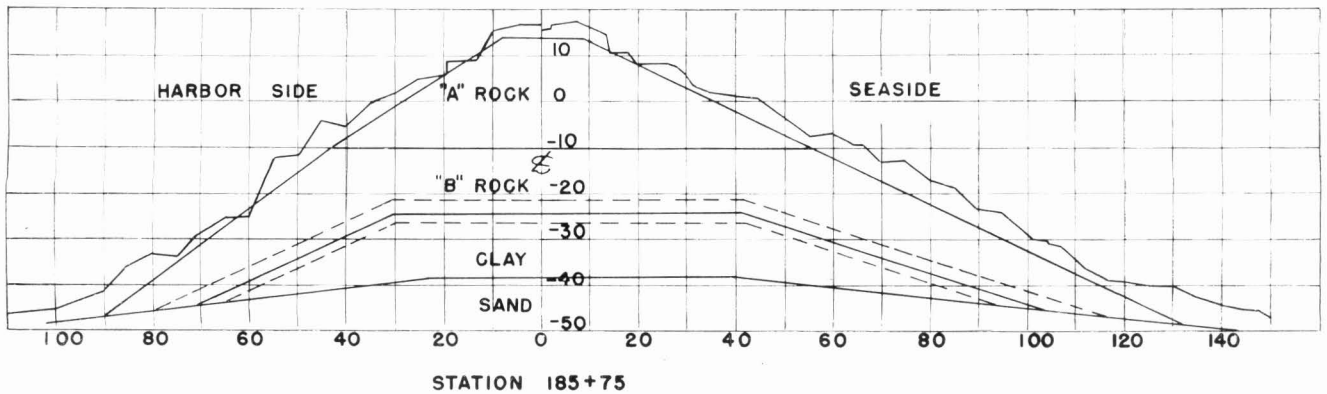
TYPICAL CROSS SECTIONS OF OUTER BREAKWATER
